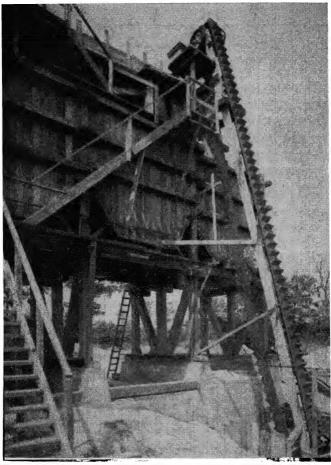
An elevator belt carrying material up a steep incline. Buckets are open at the front.
